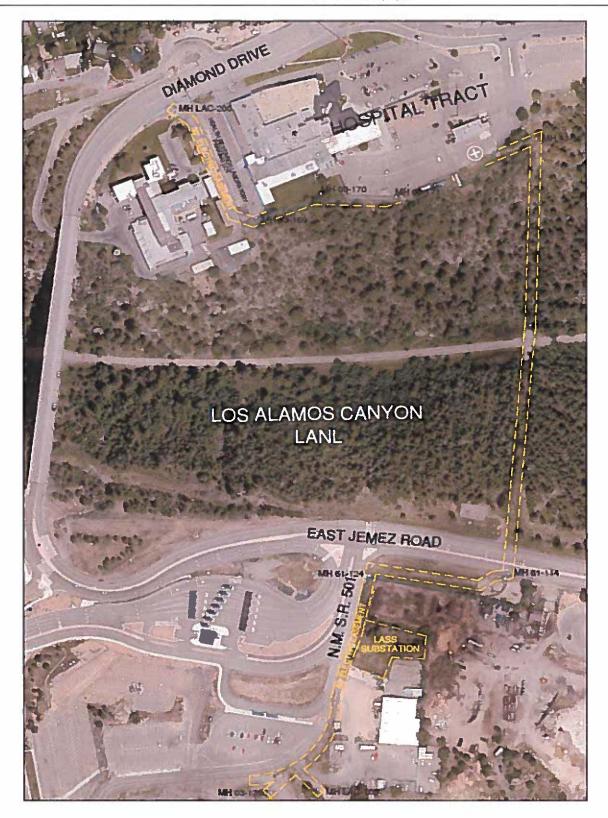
Location of the Proposed Switchgear Substation and Electrical Conduit Easements
